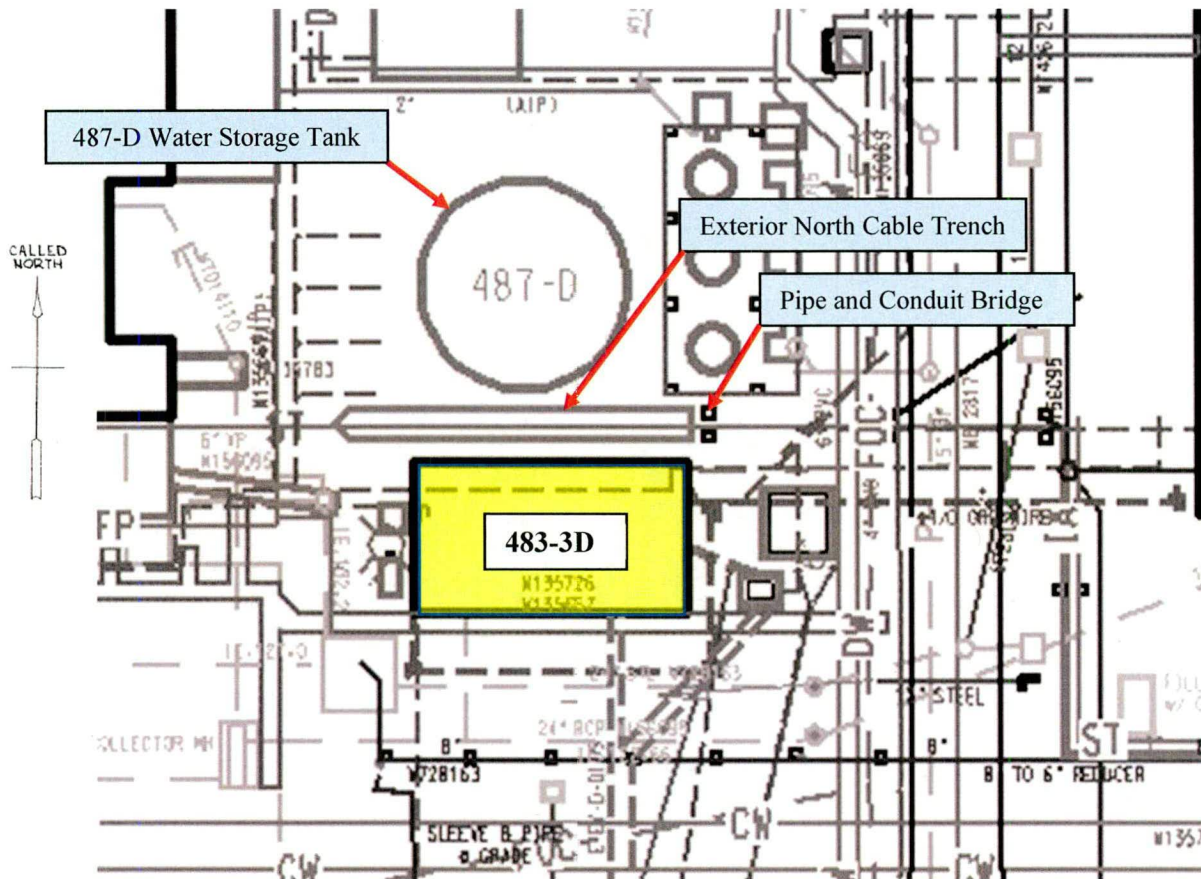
Building 483-3D and Surrounding Facilities/Utilities
